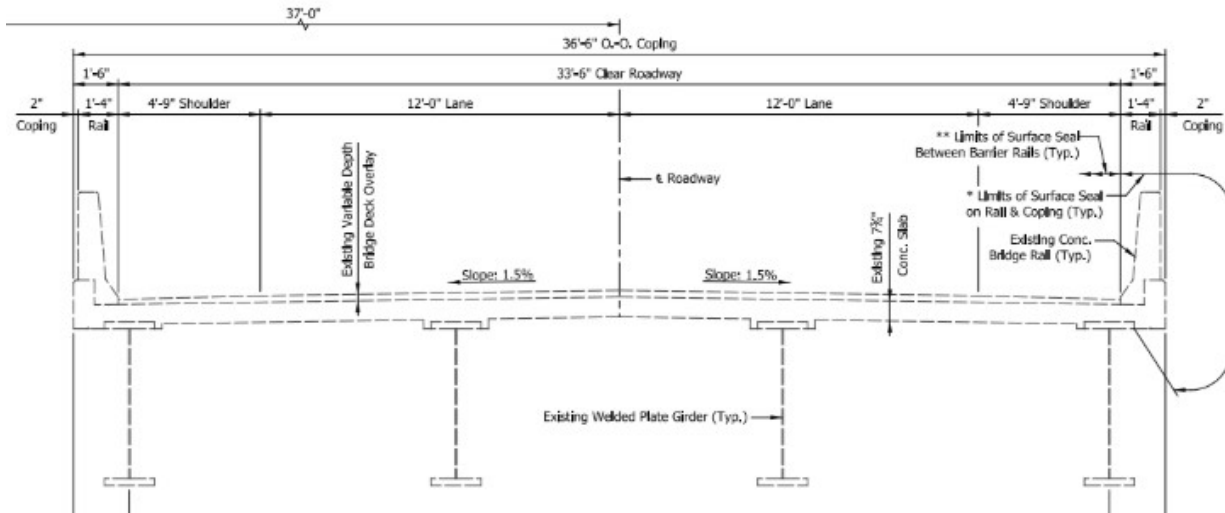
Typical Section of Spans 5-7 of the Bridge (NBI 33240) (2014)
